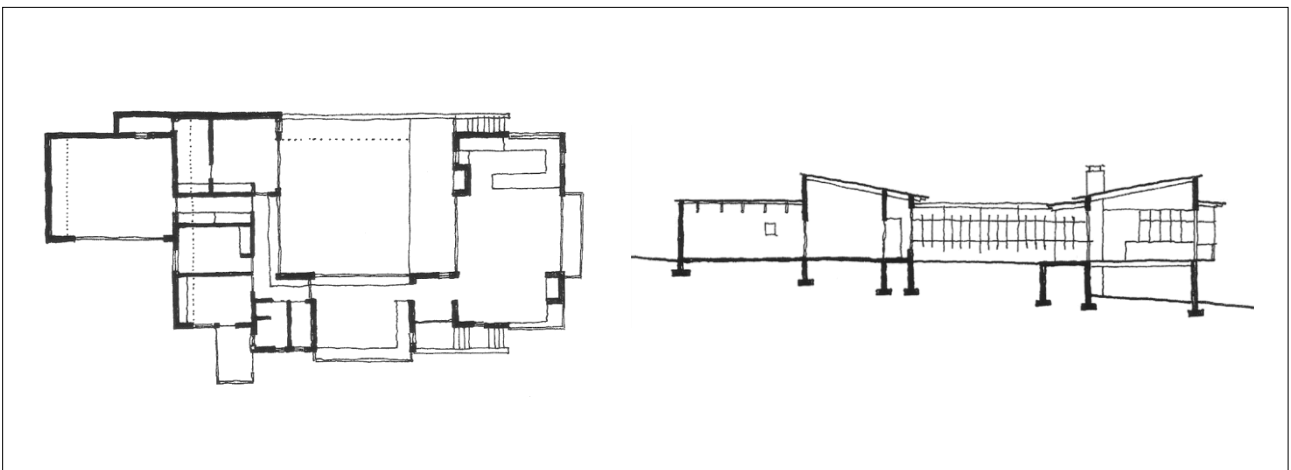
Tiobelles Street House layout plan (left) with sleeping and living areas on either side of the raised courtyard, connected by the entrance hall and studio; and long section through the raised courtyard (right).
